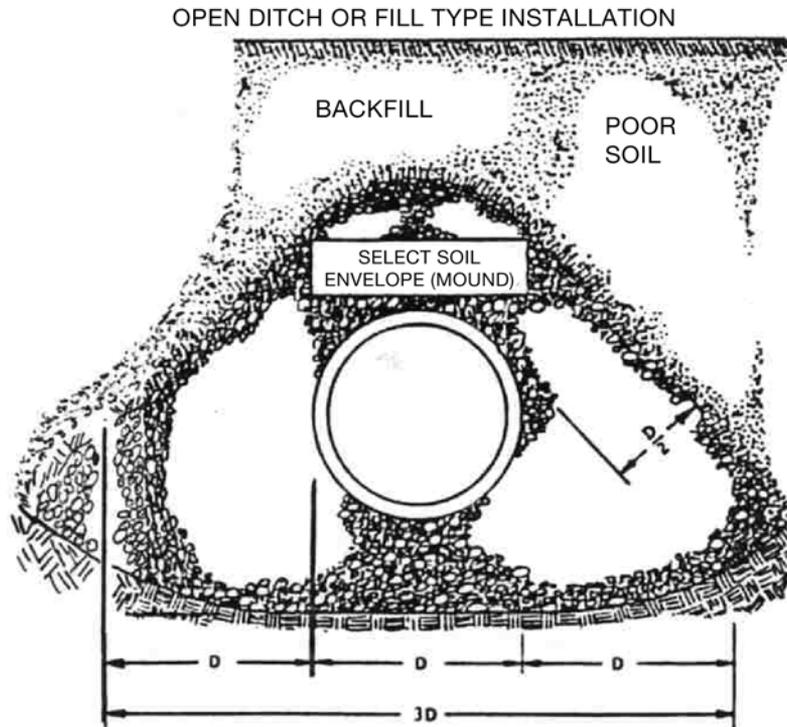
Minimum Embedment Width When Native Soil Can Not Sustain a Vertical Cut or When Installed in the Embankment Condition
